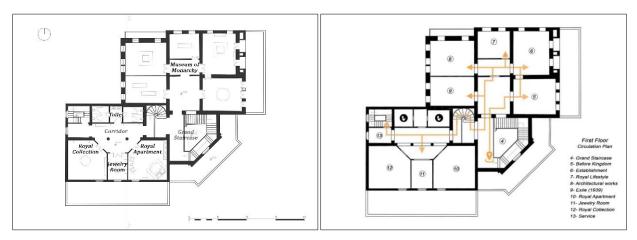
First Floor Plan Permanent Scenario Plan (left) and (right) Circulation Diagram (© Dorel Habili).
